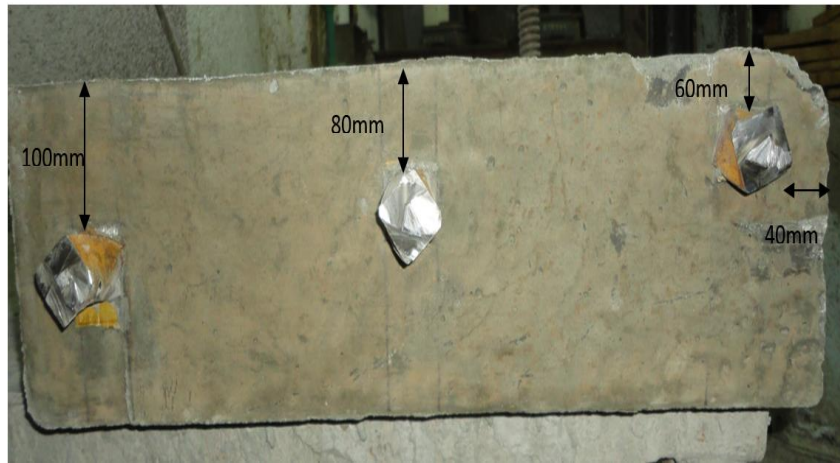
A picture showing the position of the rebars and concrete cover depth on the casted reinforced concrete block.
